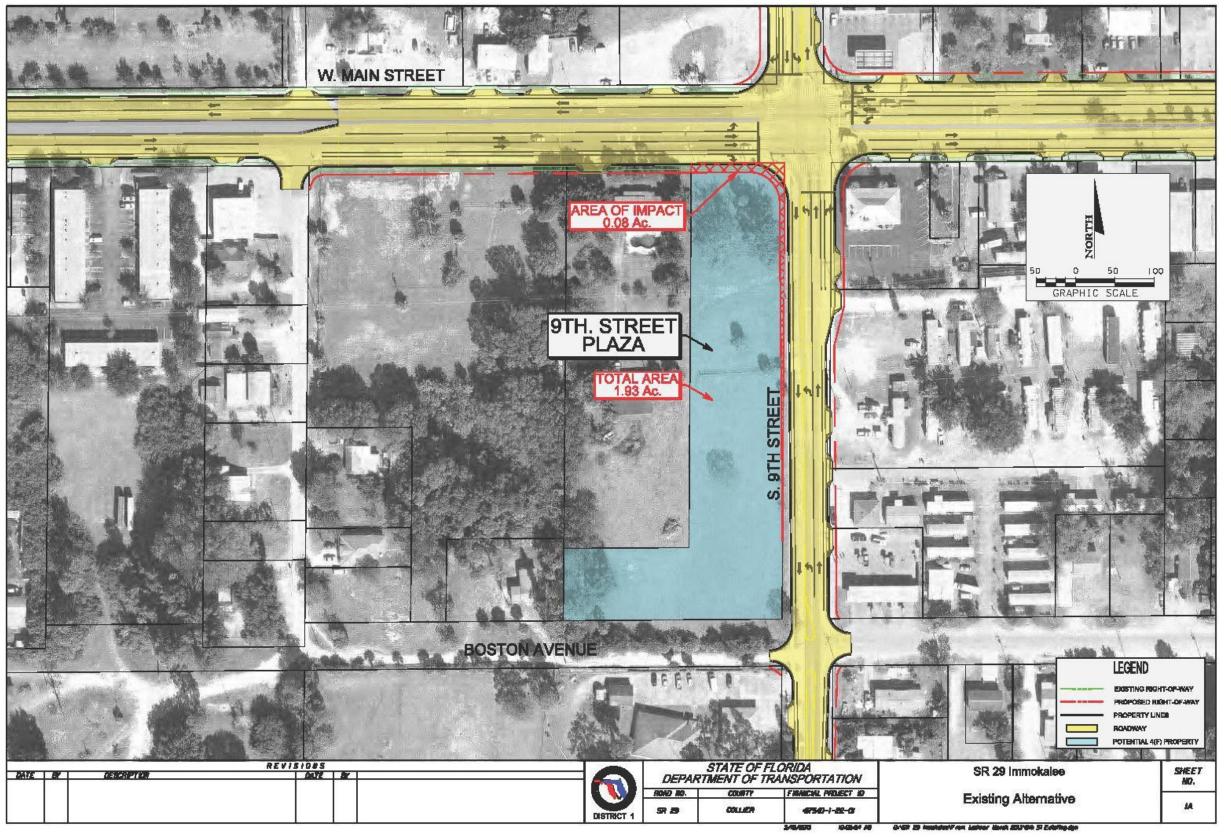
EXISTING SR 29 ALTERNATIVE POTENTIAL IMPACT TO 9TH STREET PLAZA
